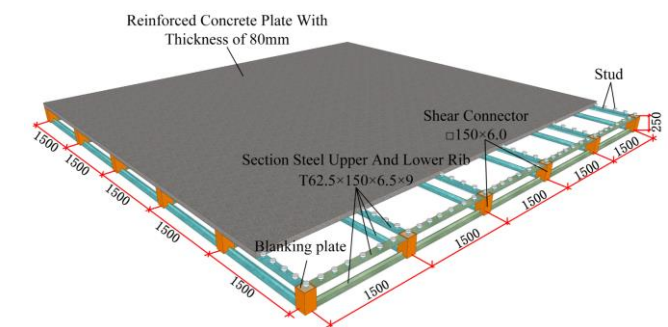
Dimensional Diagram of Steel-Concrete Composite Hollow Sandwich Plate
